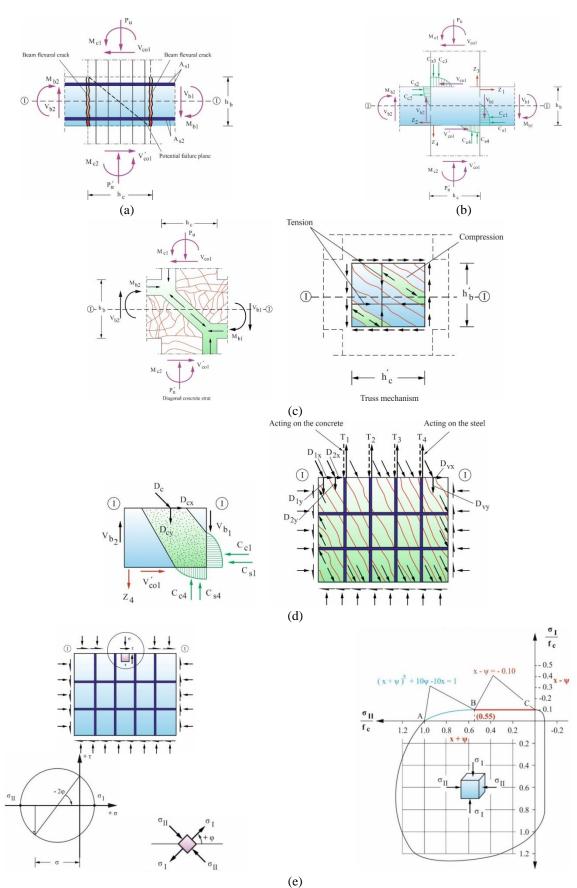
(a) Interior beam-column joint, (b) Internal forces around an Interior beam-column joint as a result of seismic actions, (c) The two mechanisms of shear transfer (diagonal concrete strut and truss mechanism), (d) Forces acting in the joint core concrete through section I - I from the two mechanisms, (e) Stress state element of studied region and representation of the concrete biaxial strength curve by a parabola of 5th degree (Tsonos 2007)
